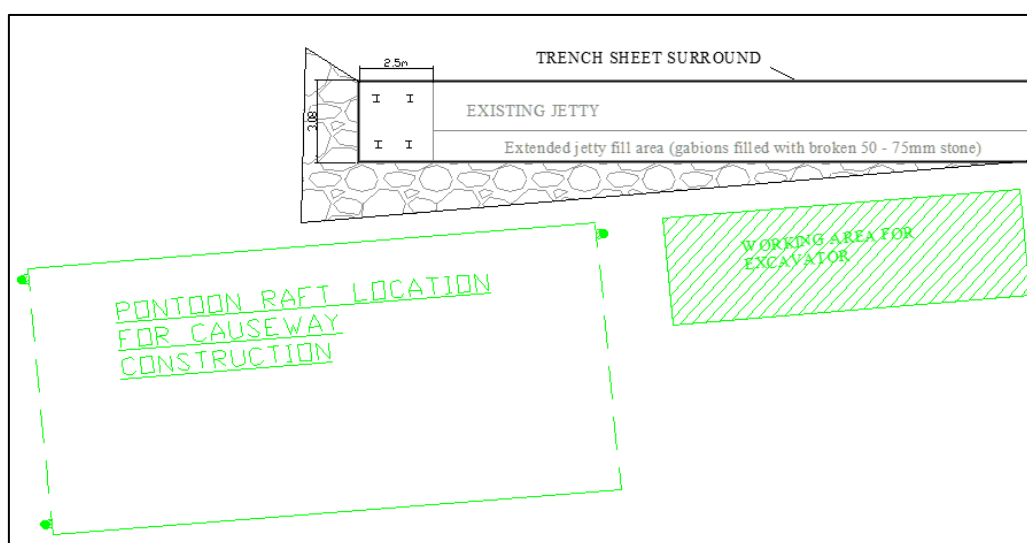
Proposed set up of pontoon raft for installation of breakwater rocks during construction of the causeway at the northwest shore of Inis Cealtra.
